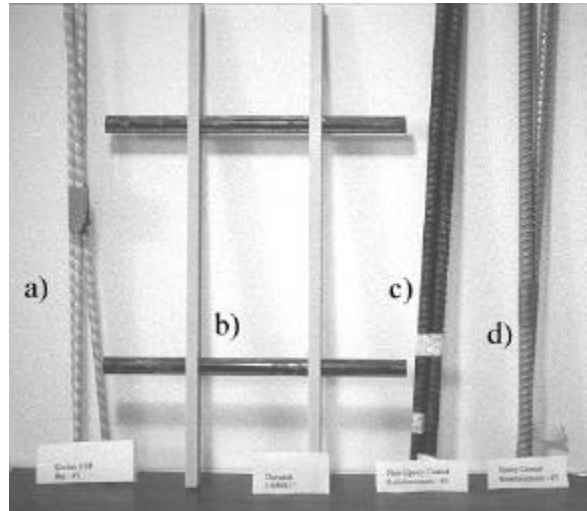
Reinforcement bars used in this study. a) Kodiak #3 FRP rebar, b) Duradek I-6000 grid, c) non-coated steel reinforcement bar, and d) epoxy-coated steel reinforcement bar
